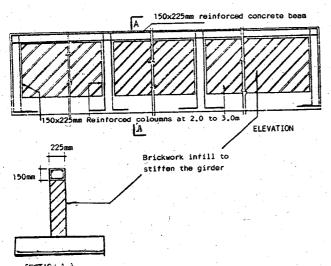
VIERENDEEL GIRDER SYSTEM OF FOUNDATION
